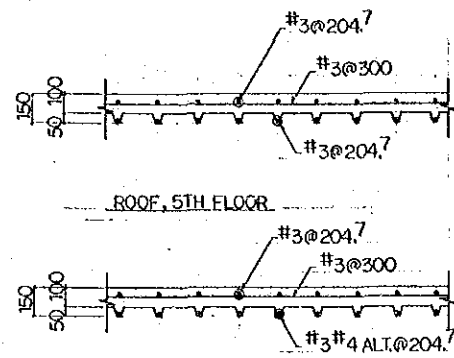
DETAILED STRUCTURAL ELEVATION ALONG COL. LINES
